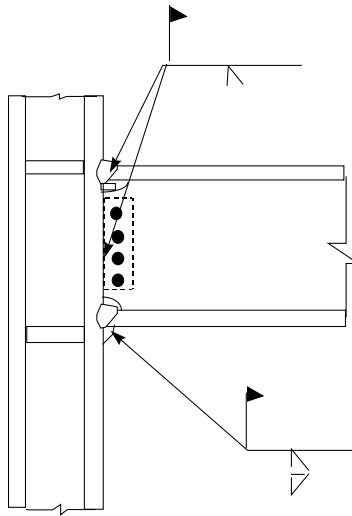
Typical Bolted Web, Welded Flange Connection
